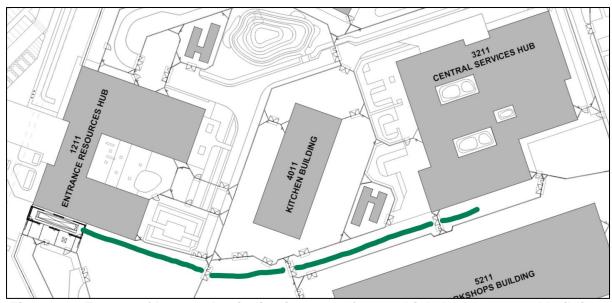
Extract of layout plan indicating route from vehicle lock to central building in green
